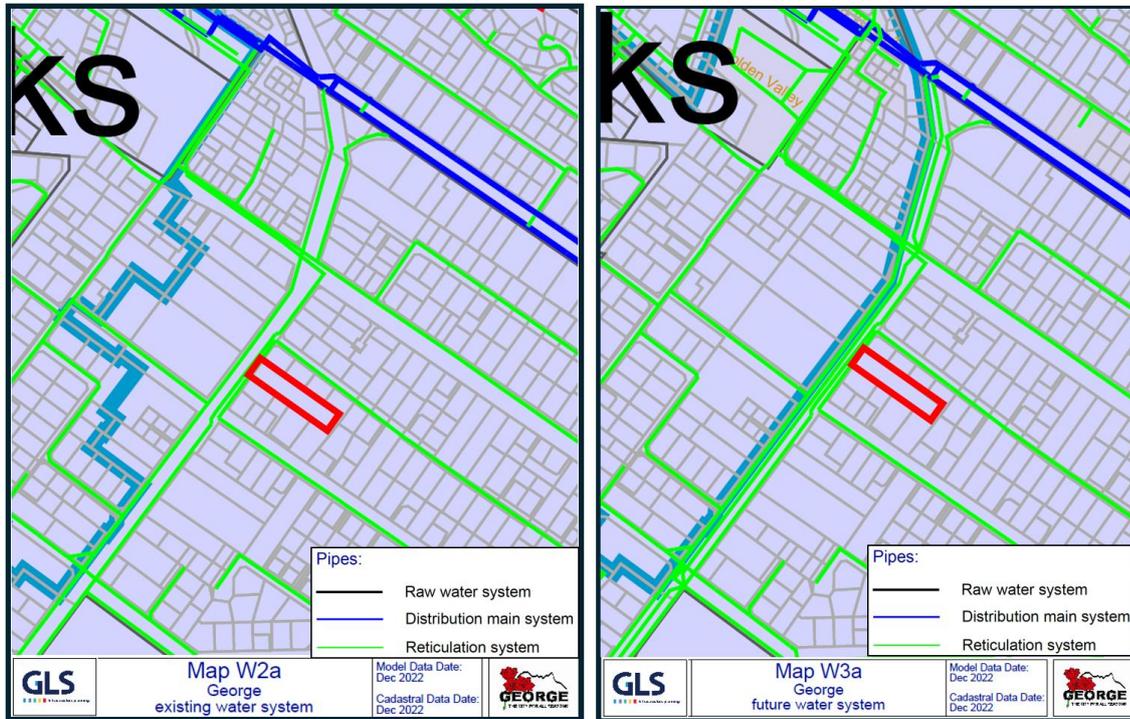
GLS Consulting Existing and Proposed Future Water system – (One additional Reticulation Line is planned along Montagu Street)
